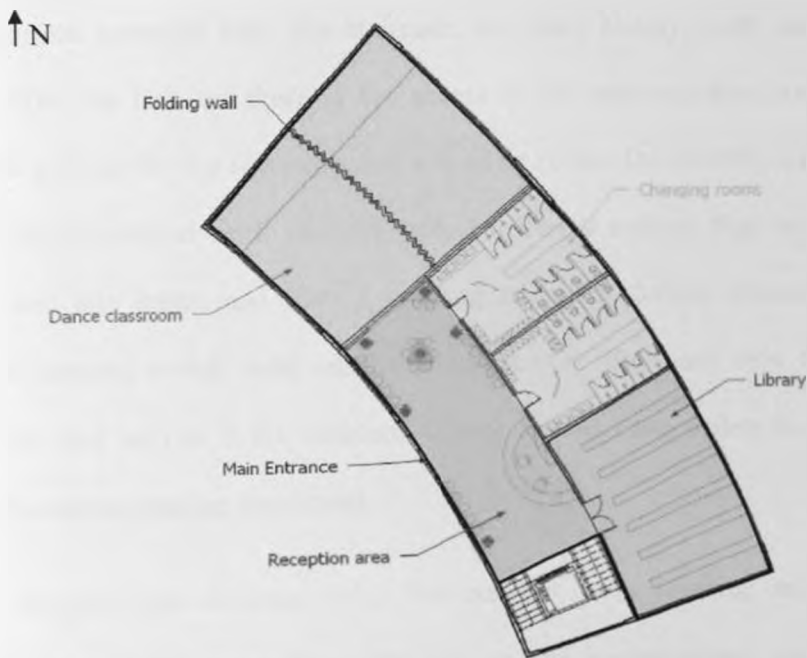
16 – Education building ground floor layout. Source: Author, 2013.
